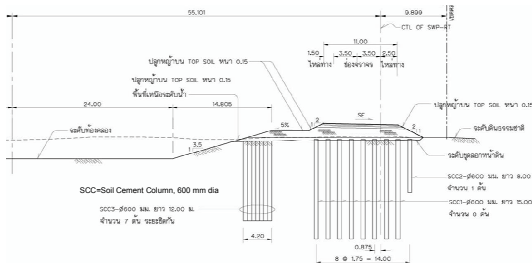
An example of problematic application of cement columns in stabilizing slope in soft Bangkok clay.
